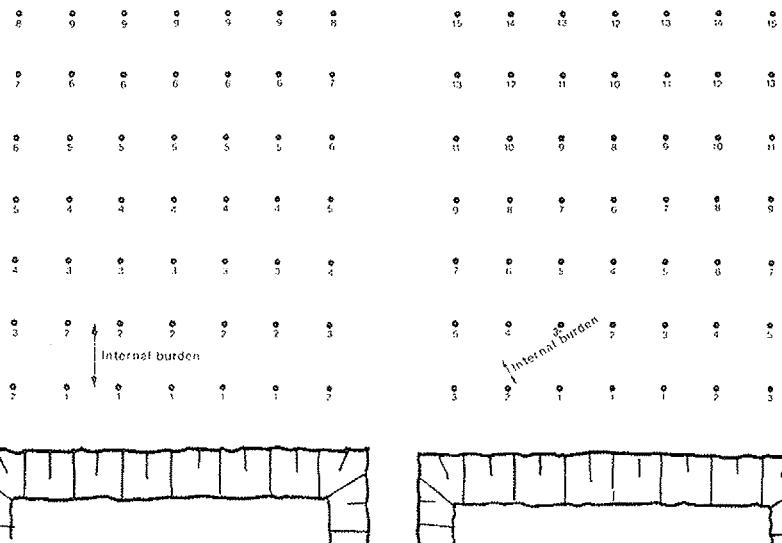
By changing the firing pattern, the internal burden may be minimized and the constriction lowered.
